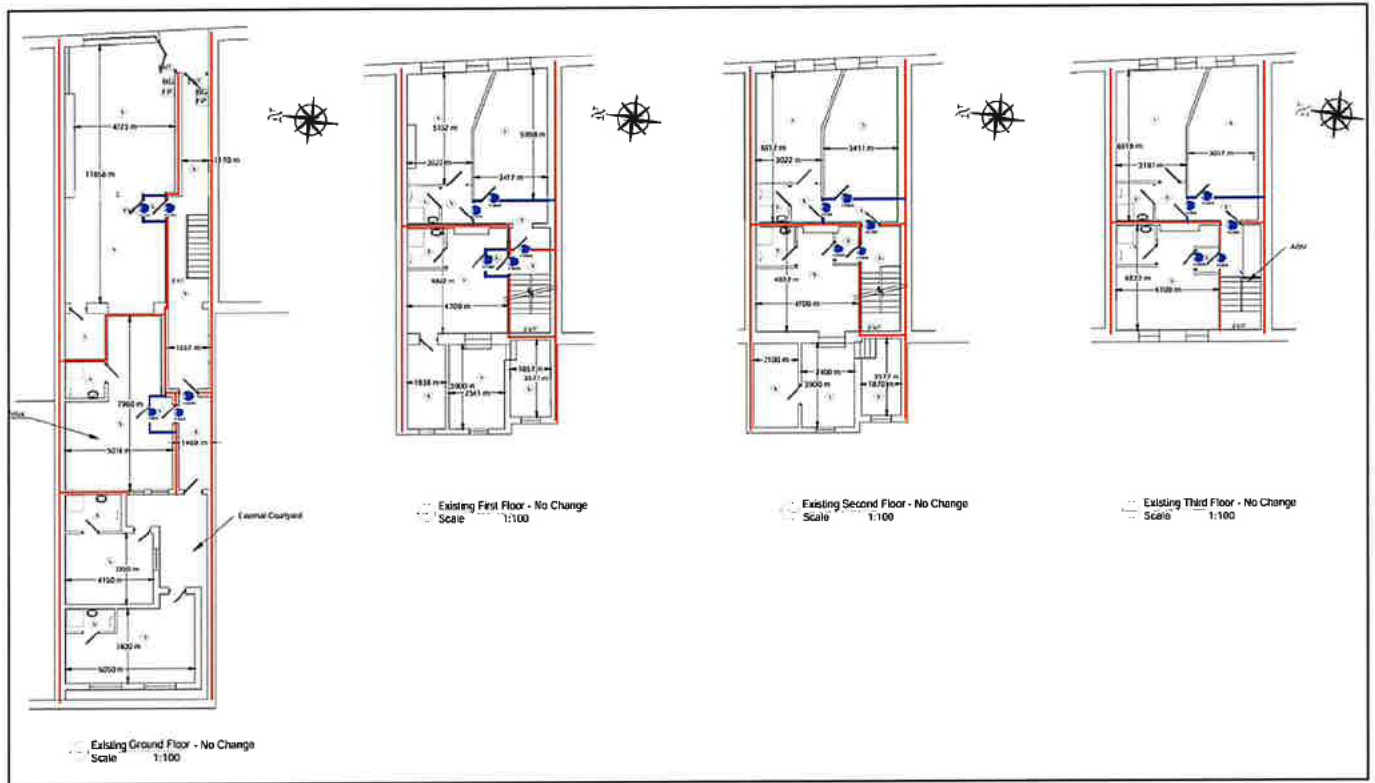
Floor plans of the subject site, showing the existing internal layout of the property.
